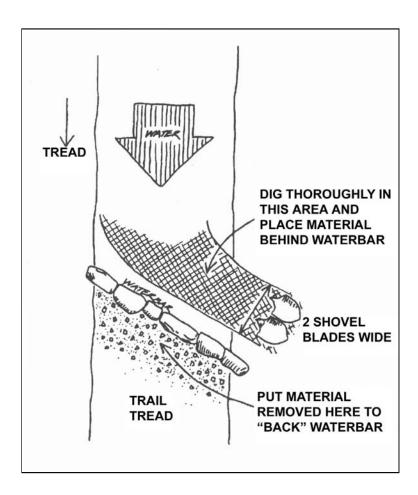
Specifications for swale construction (this diagram shows stone water bars, but swale specifications are the same for log). Diagram adapted from Stephen Griswold, *A Handbook on Trail Building and Maintenance*, 1996, 50.
